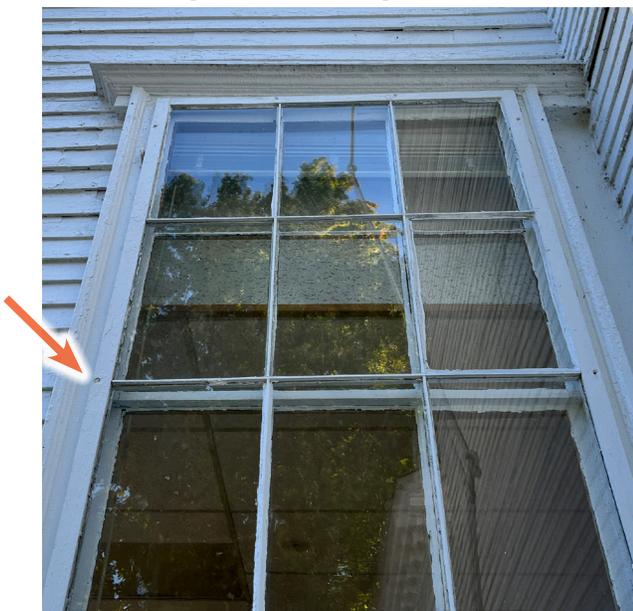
Typical condition of the storm windows at the first floor. Note that they are inoperable and unvented.
